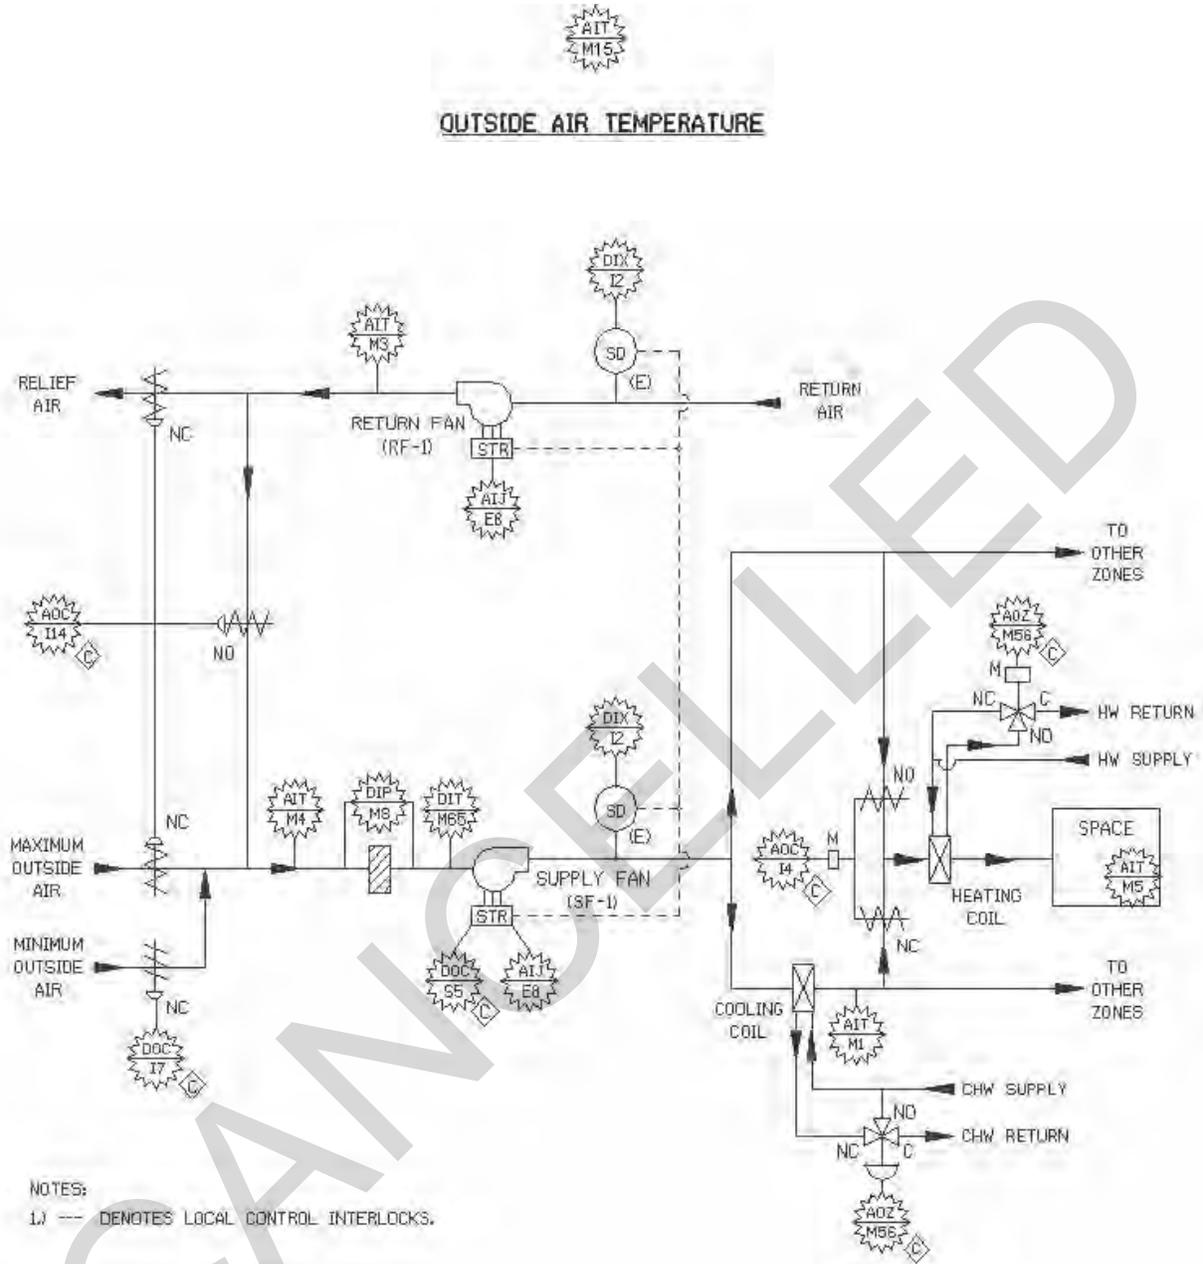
Bypass Multi-Zone Air Handling System with Hot Water and Chilled Water Coils.
